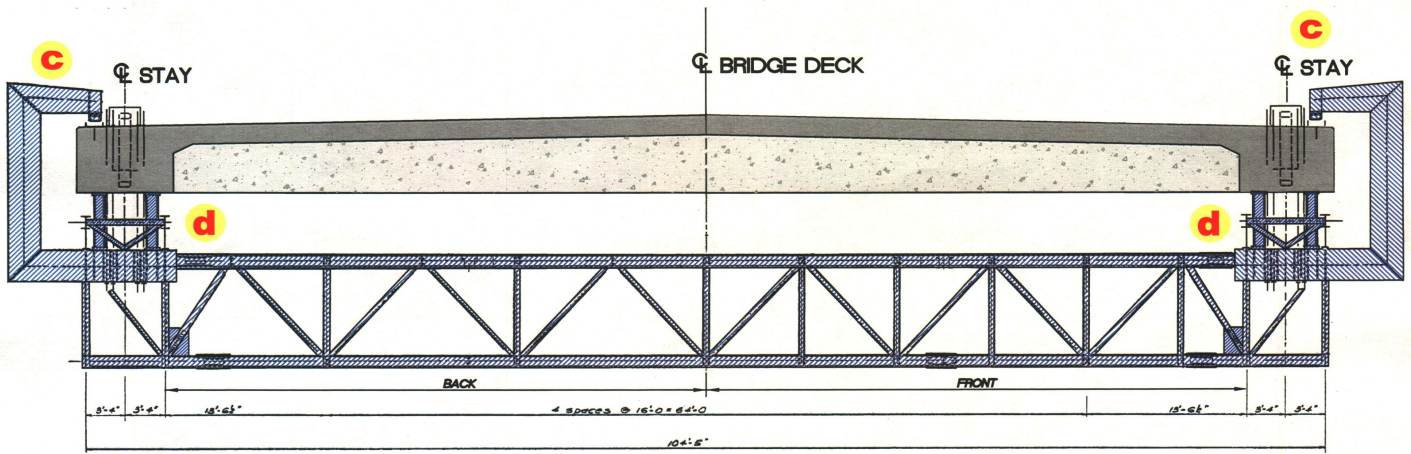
TRANSVERSE SECTION OF CIP CABLE STAYED DECK, C-CLAMP BEARING POINTS (c) & (d) AND CONNECTING SPACE TRUSS
